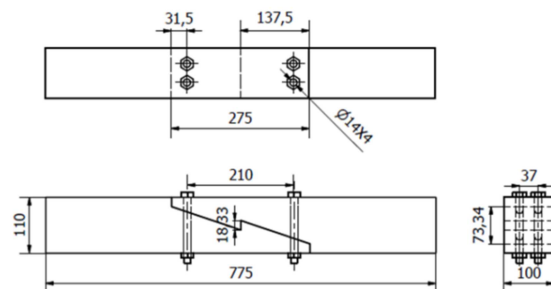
Design of Hook Oblique Lip Joint with Bolt (B4)
